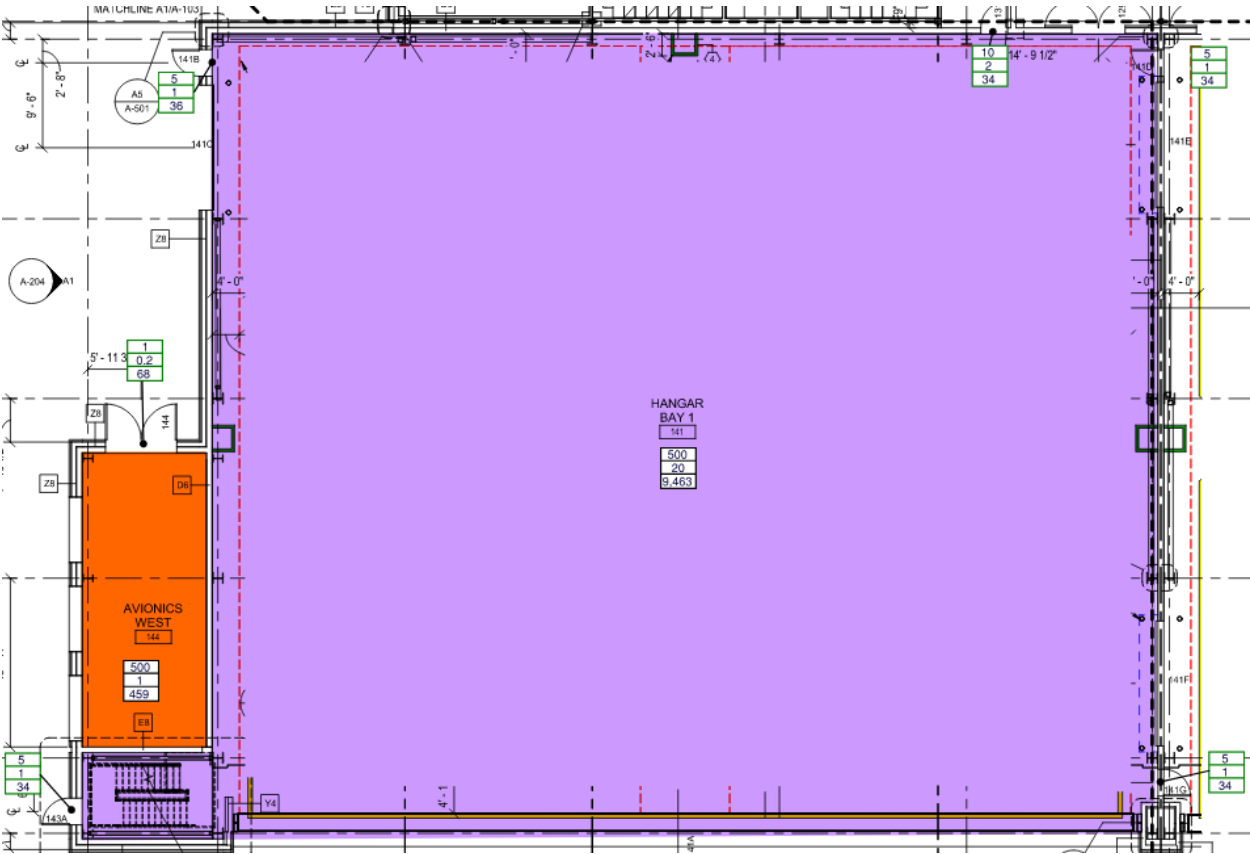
1<sup>st</sup> Floor Area C Exit Capacity
